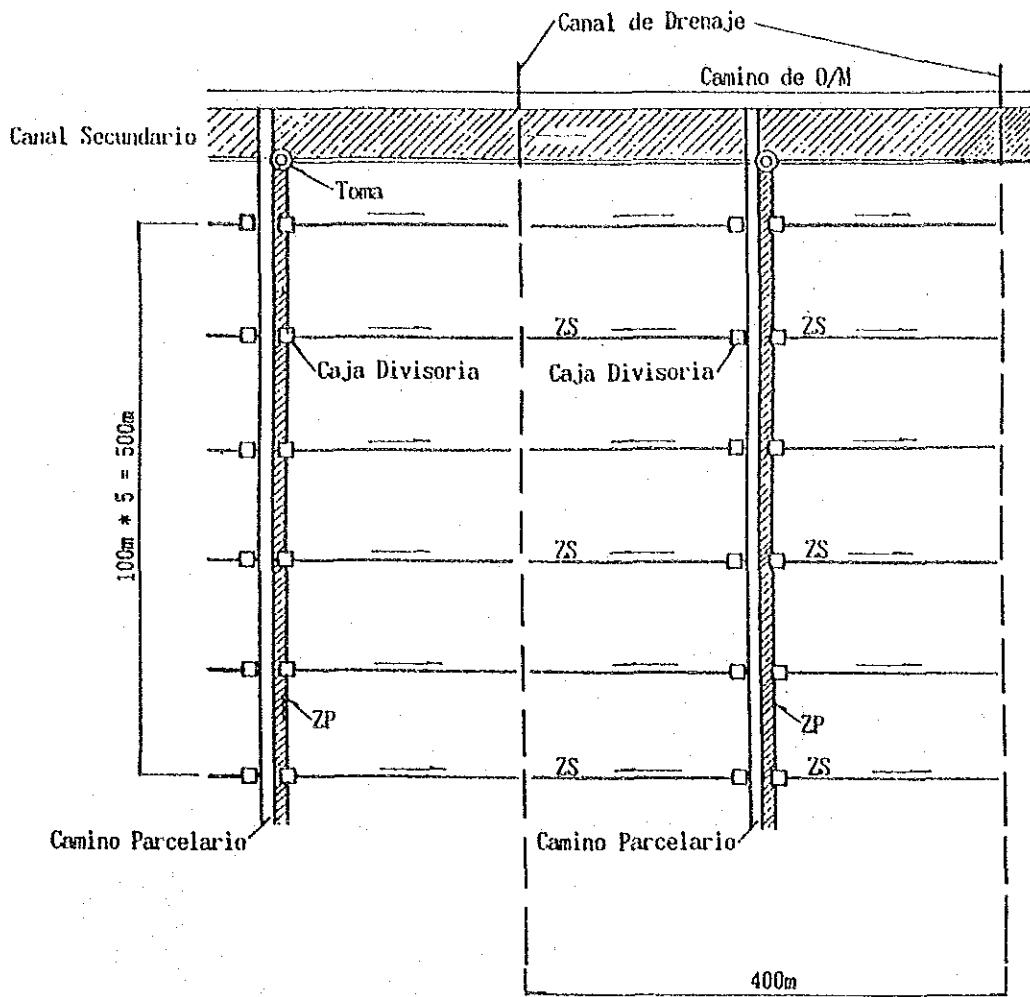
TYPICAL LAYOUT OF ON-FARM FACILITIES
